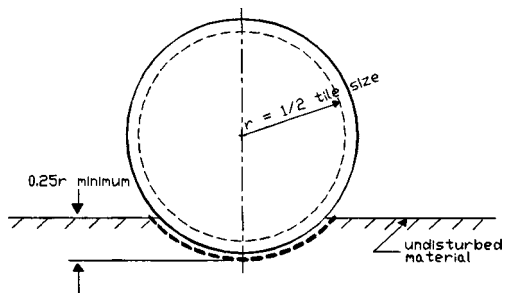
Circular bedding dimensions for formed trench bottom for clay and concrete drain tile
